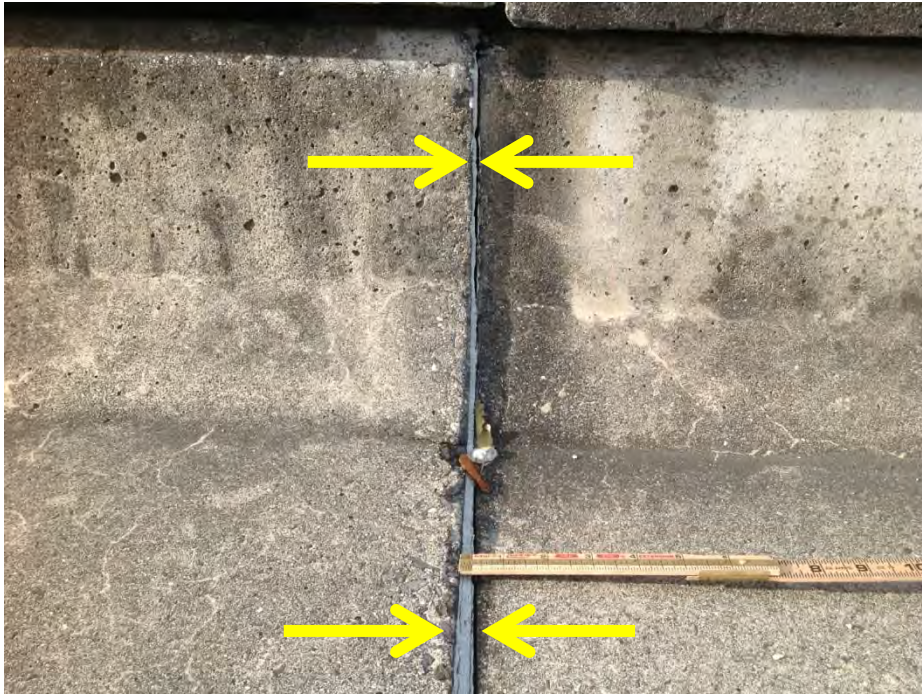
Example of cracking at sloped transition and vertical surface at end of precast concrete seating element.
